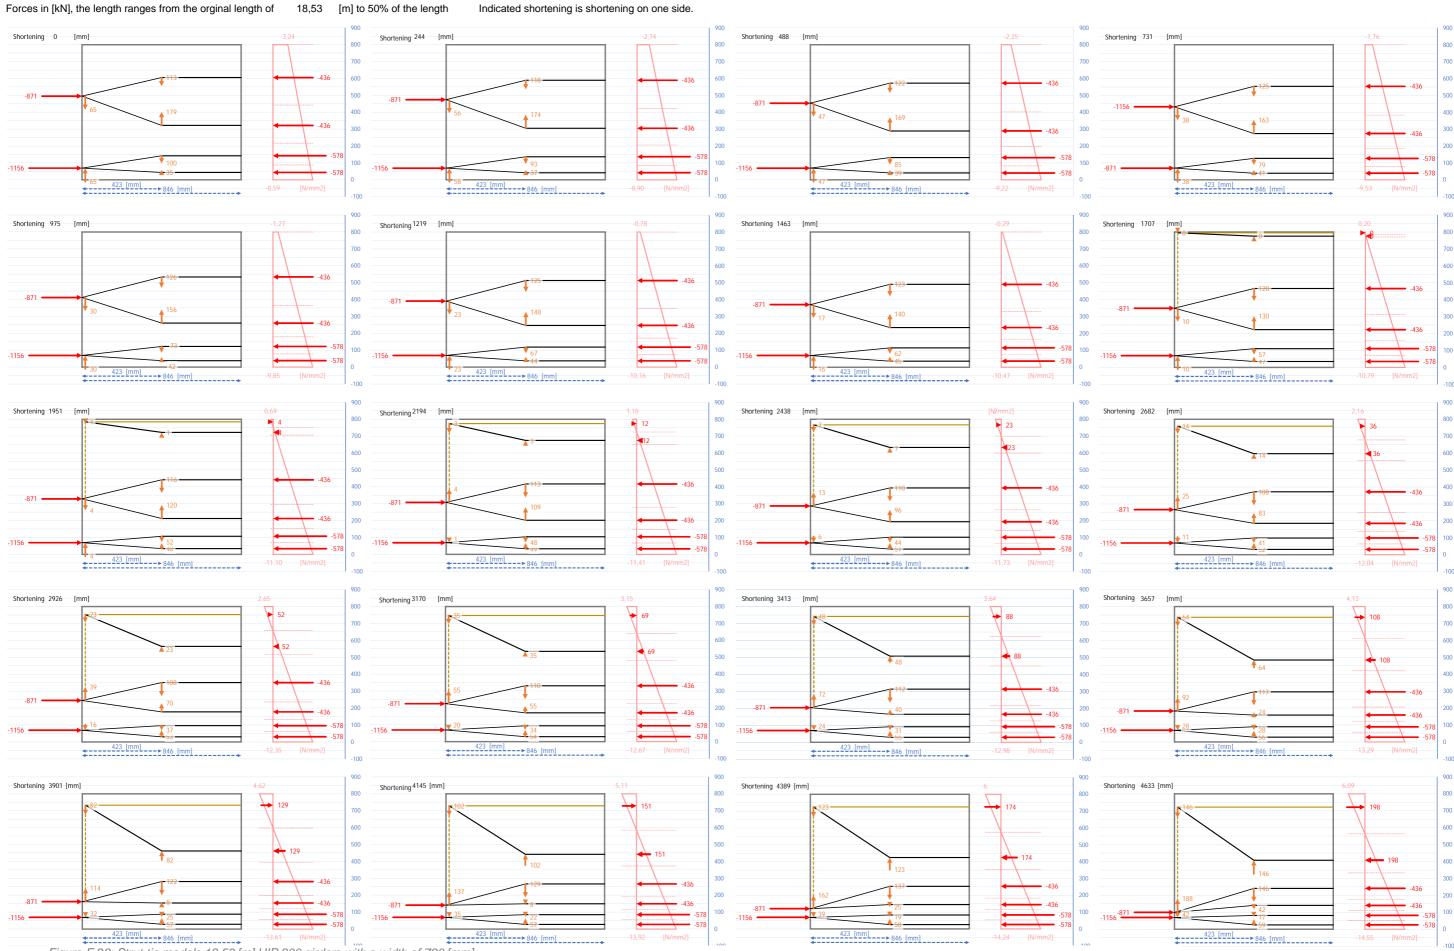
Strut-tie models 18,53 [m] HIP 800 girders with a width of 790 [mm].
